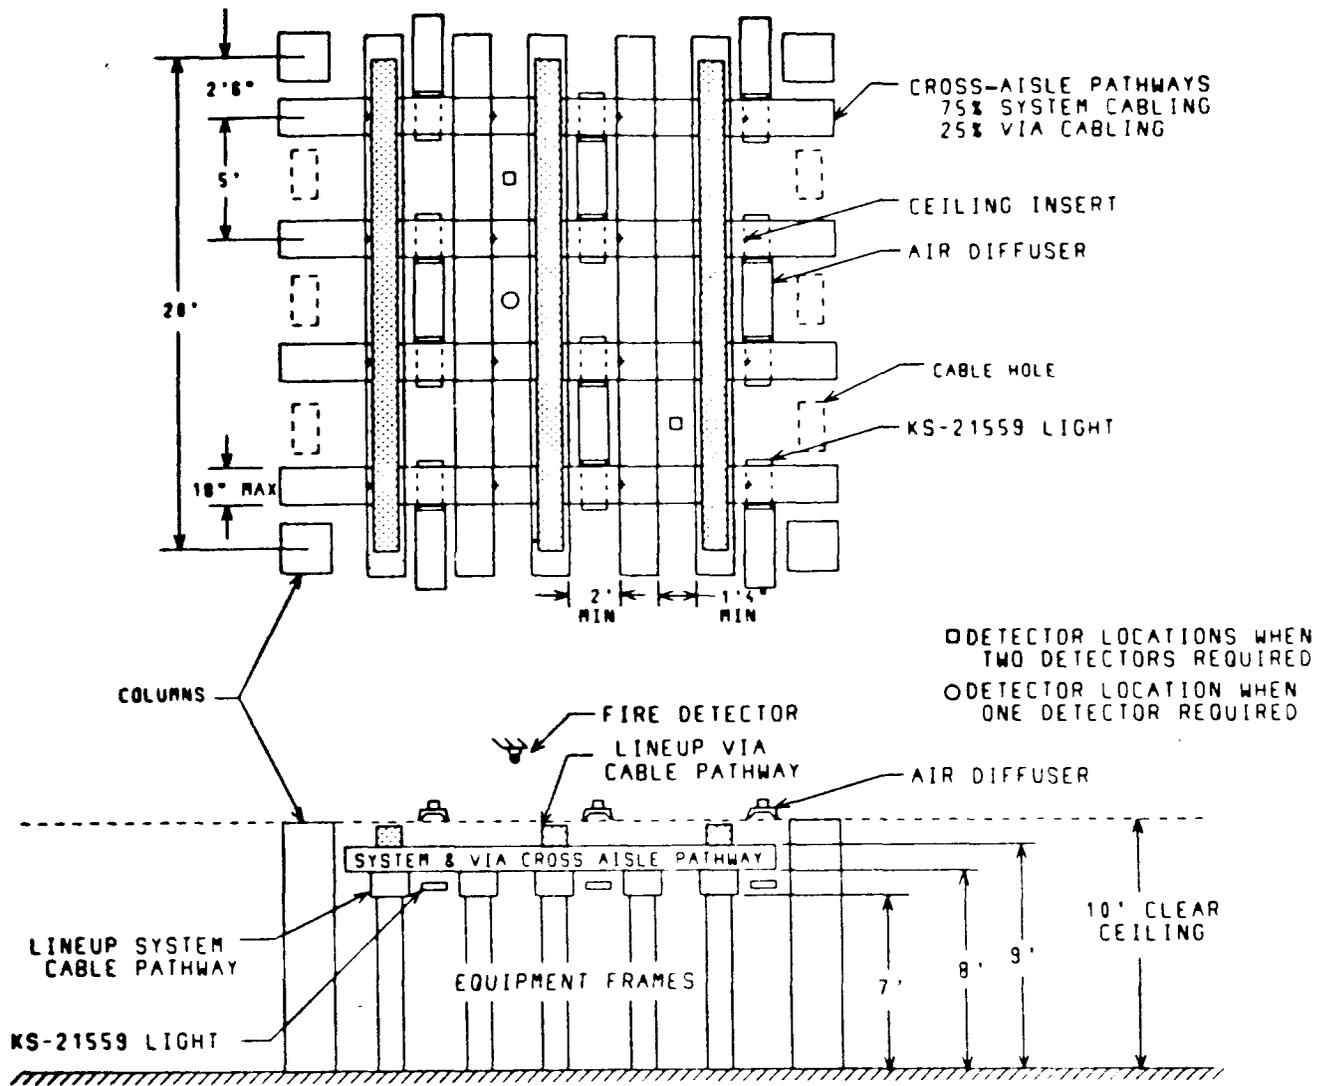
Cable Pathways Plan for 12-Inch Deep Frame Areas
